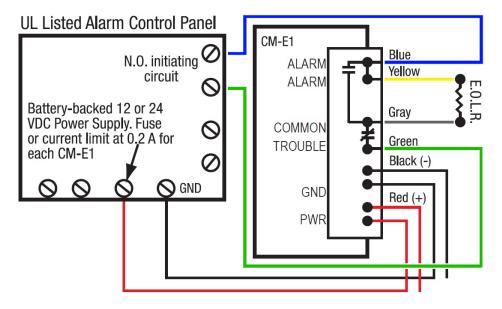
Typical Connection of a Single CM-E1 to an Alarm Control panel
